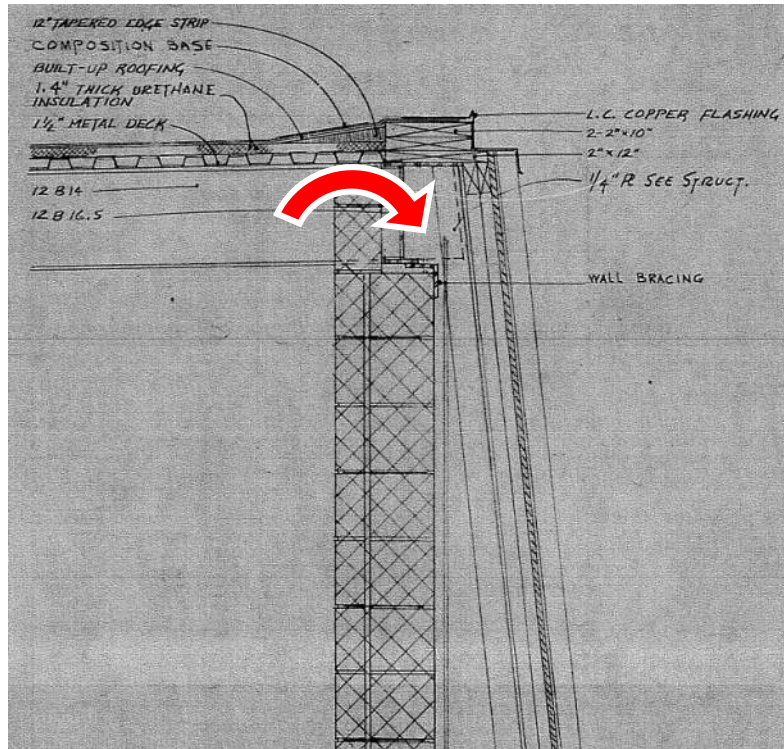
Roof-to-wall section detail. Typical at areas where metal fascia transitions to BUR roof, detail taken from Detail 3/13 of the 1968 Drawings.
